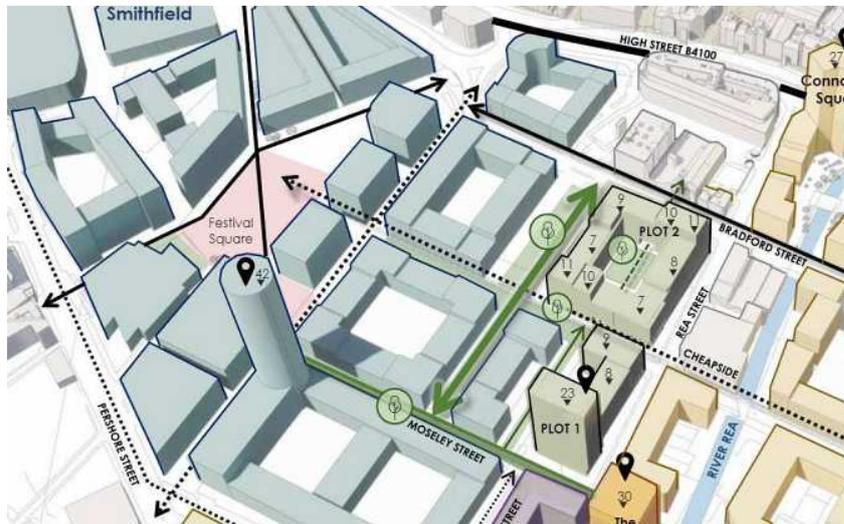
Proposed site layout and indicative layout of remainder of Smithfield Masterplan area (Source: Design and Access Statement)
